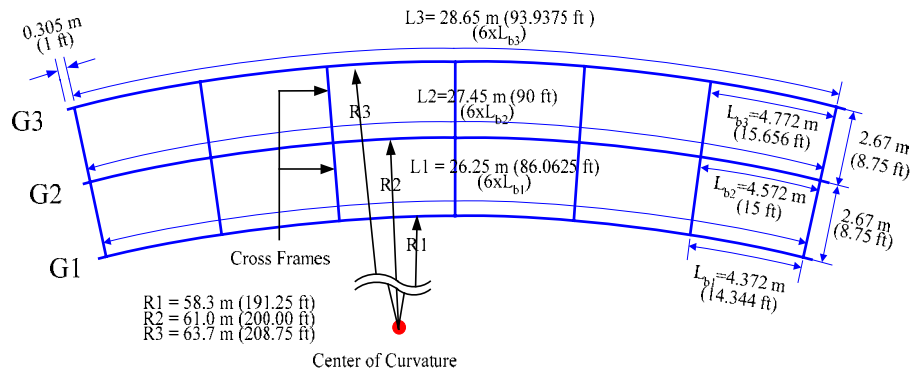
Plan view of the bare steel girder configuration for the composite test bridge with the spacing between the cross-frames on G2 set to 4.57 m (15 ft) instead of 6.86 m (22.5 ft).
